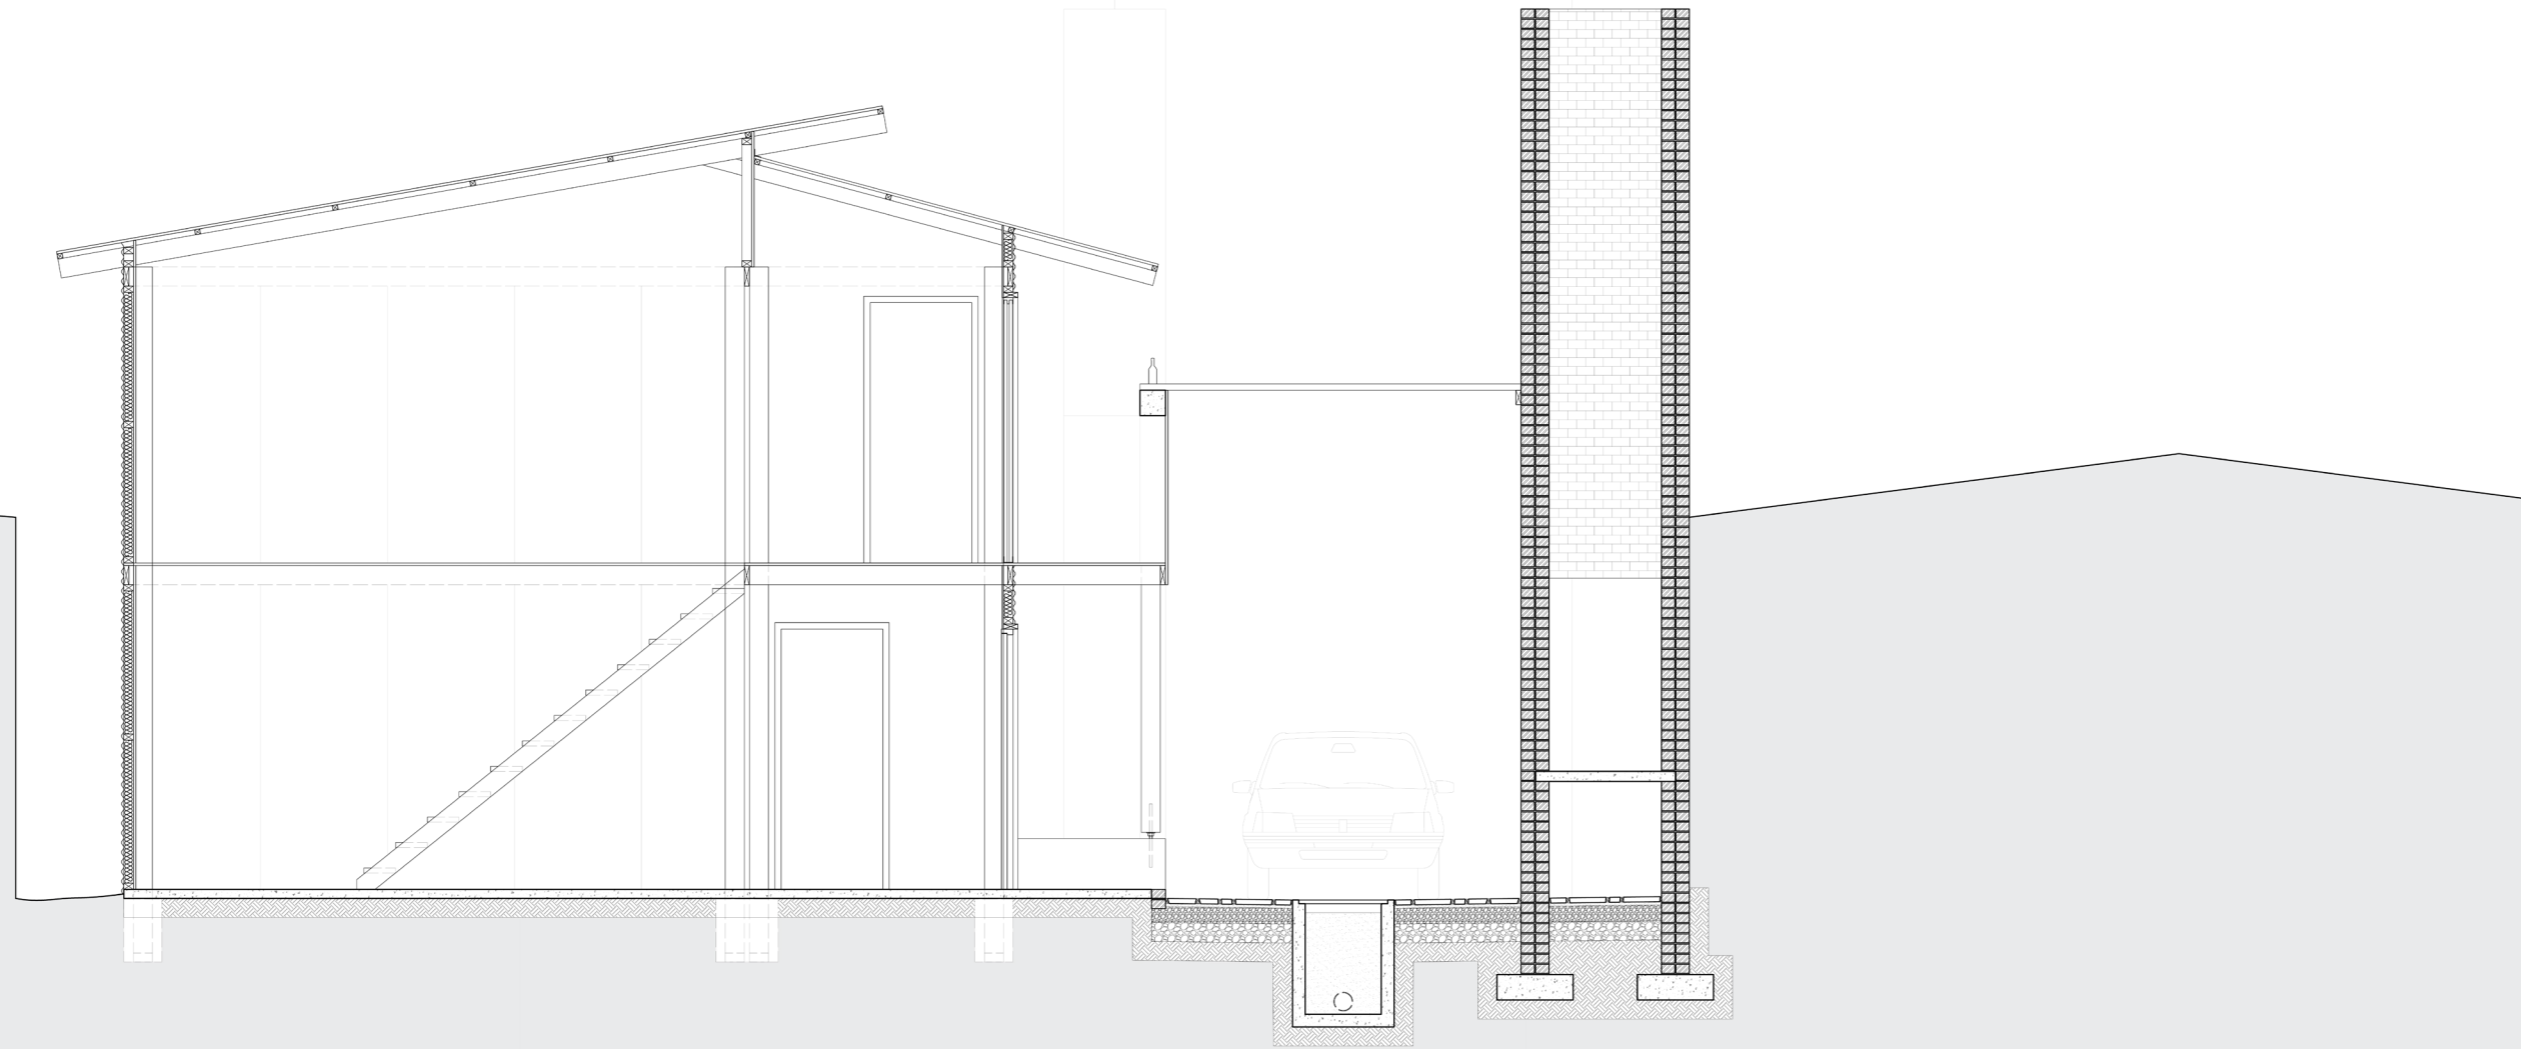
Section C-C taken through Roy's dwelling (Author 2022)
